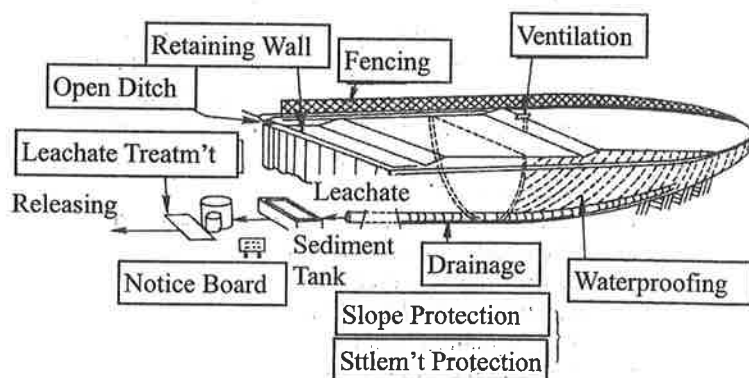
REQUIRED FACILITIES FOR CONTROL TYPE FINAL DISPOSAL SITE
